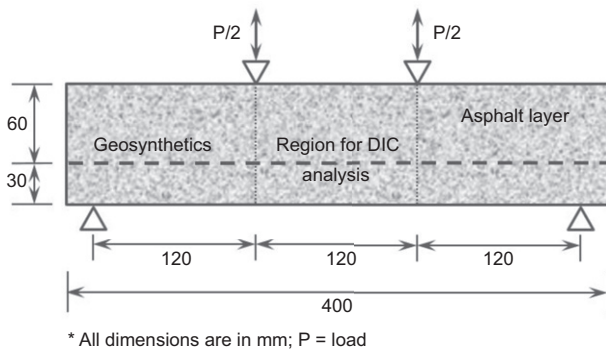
Schematic diagram of asphalt beam specimen and test setup
